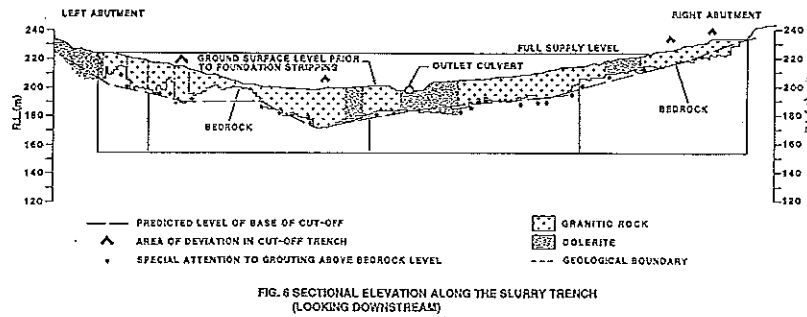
Sectional Elevation Along the Slurry Trench (Looking Downstream)
